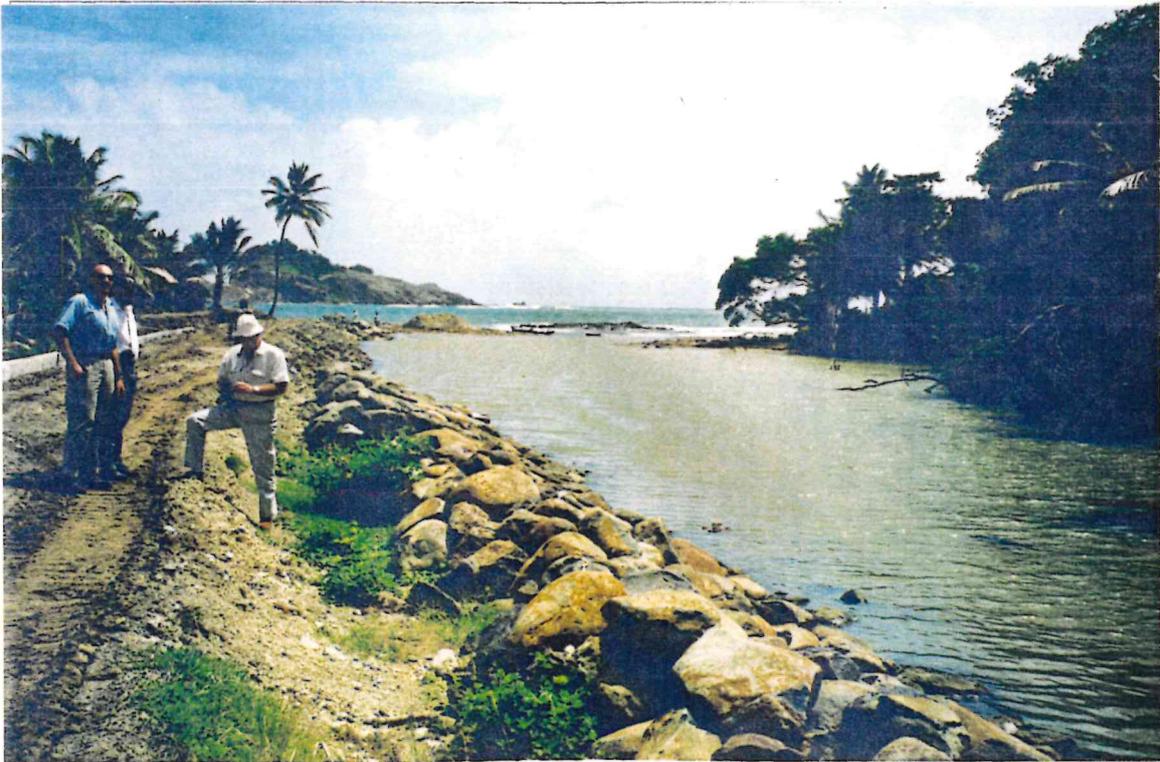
Massive rip-rap protection to Dennery town (view DS to outfall). Work still to be completed.
